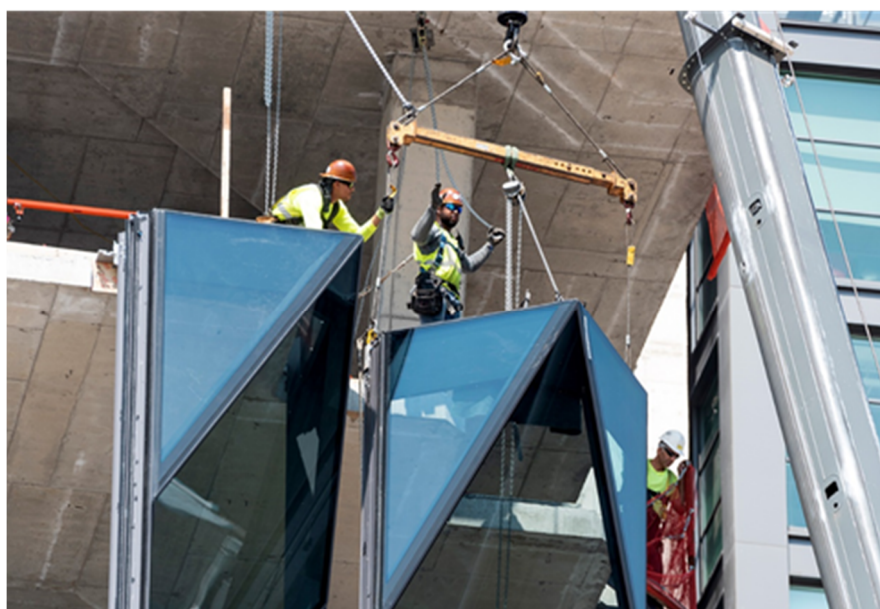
Several workers working at height during the CWM installation process (facade installation in Solar Carve Tower, New York. Facade engineered and manufactured by Focchi Group; photo by Timothy Schenck).
